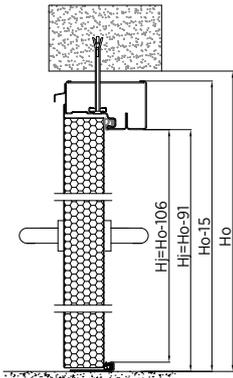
Installation of the single-leaf door to a masonry wall - internal frame with a thermal break - vertical cross-section
